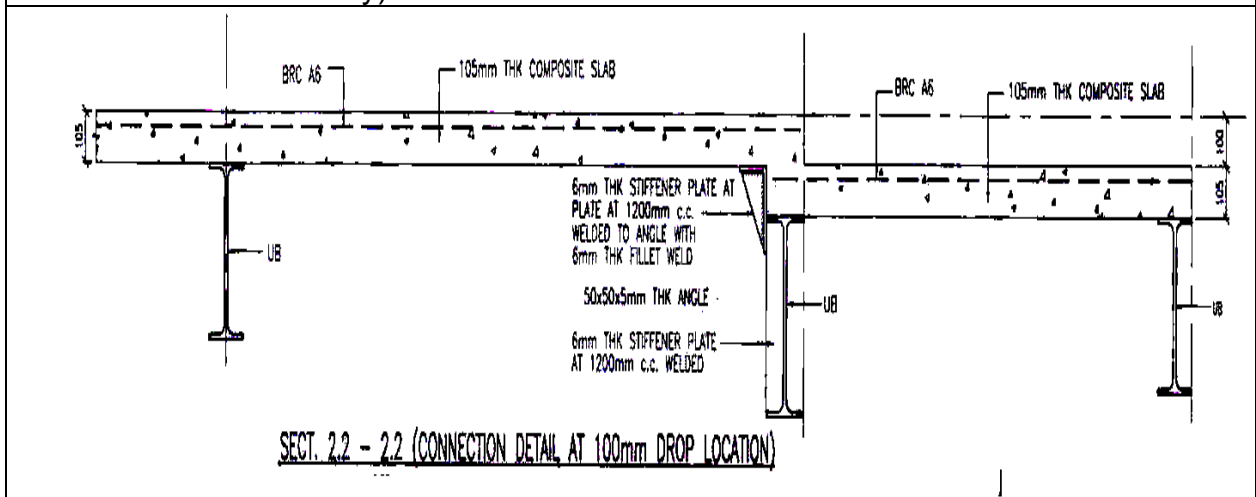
Connection details for 100mm drop in slab (details and sizes shown are indicative only)
